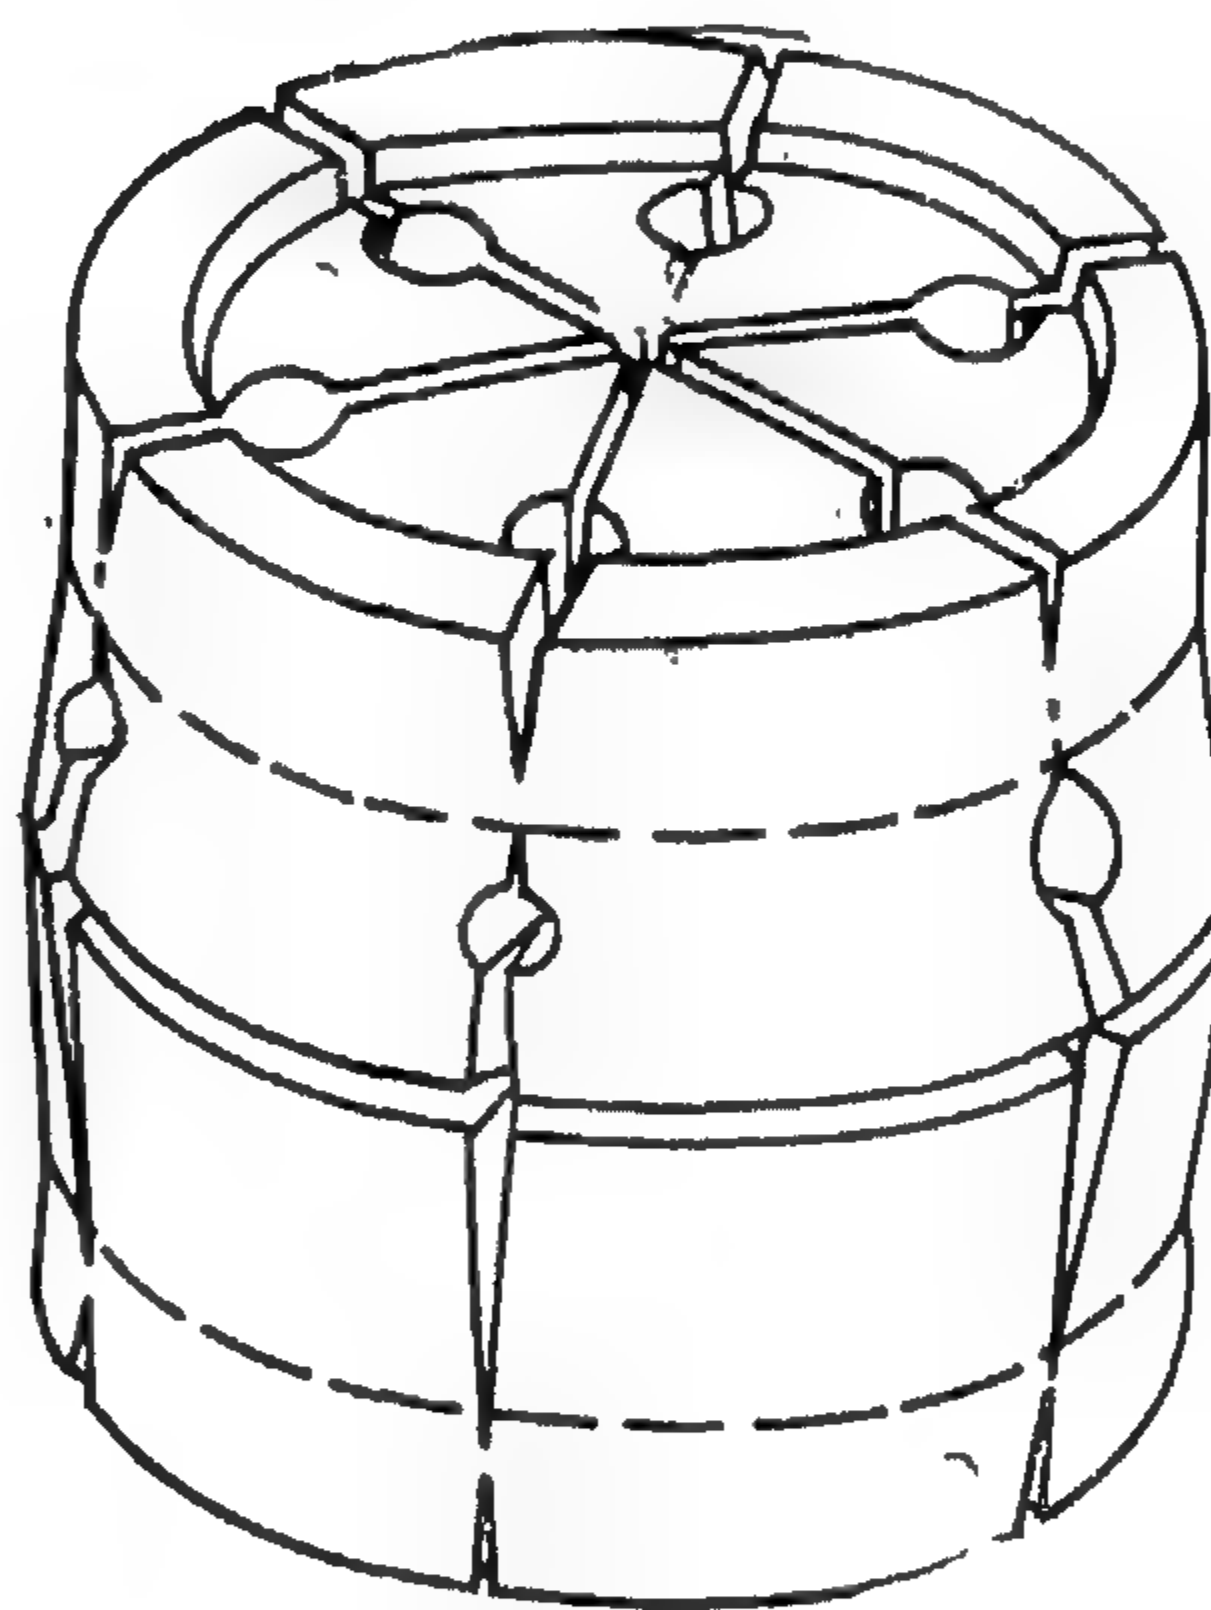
Perspective mode of failure of prestressed concrete pressure vessel
